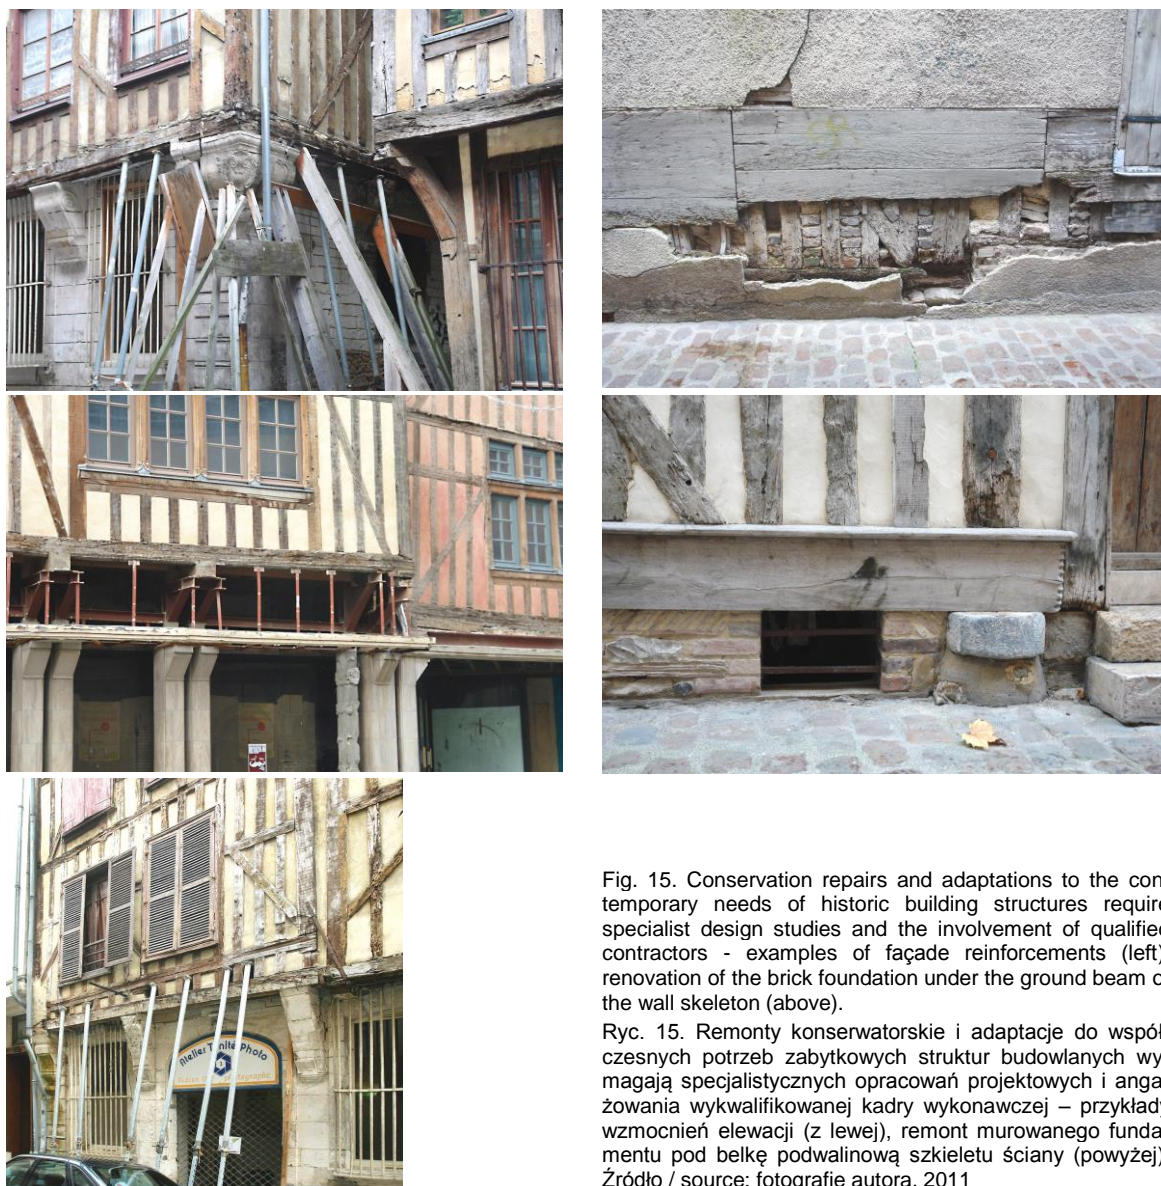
Conservation repairs and adaptations to the contemporary needs of historic building structures require design studies and the involvement of qualified contractors - examples of façade reinforcements (left), renovation of the brick foundation under the ground beam of the wall skeleton (above).
